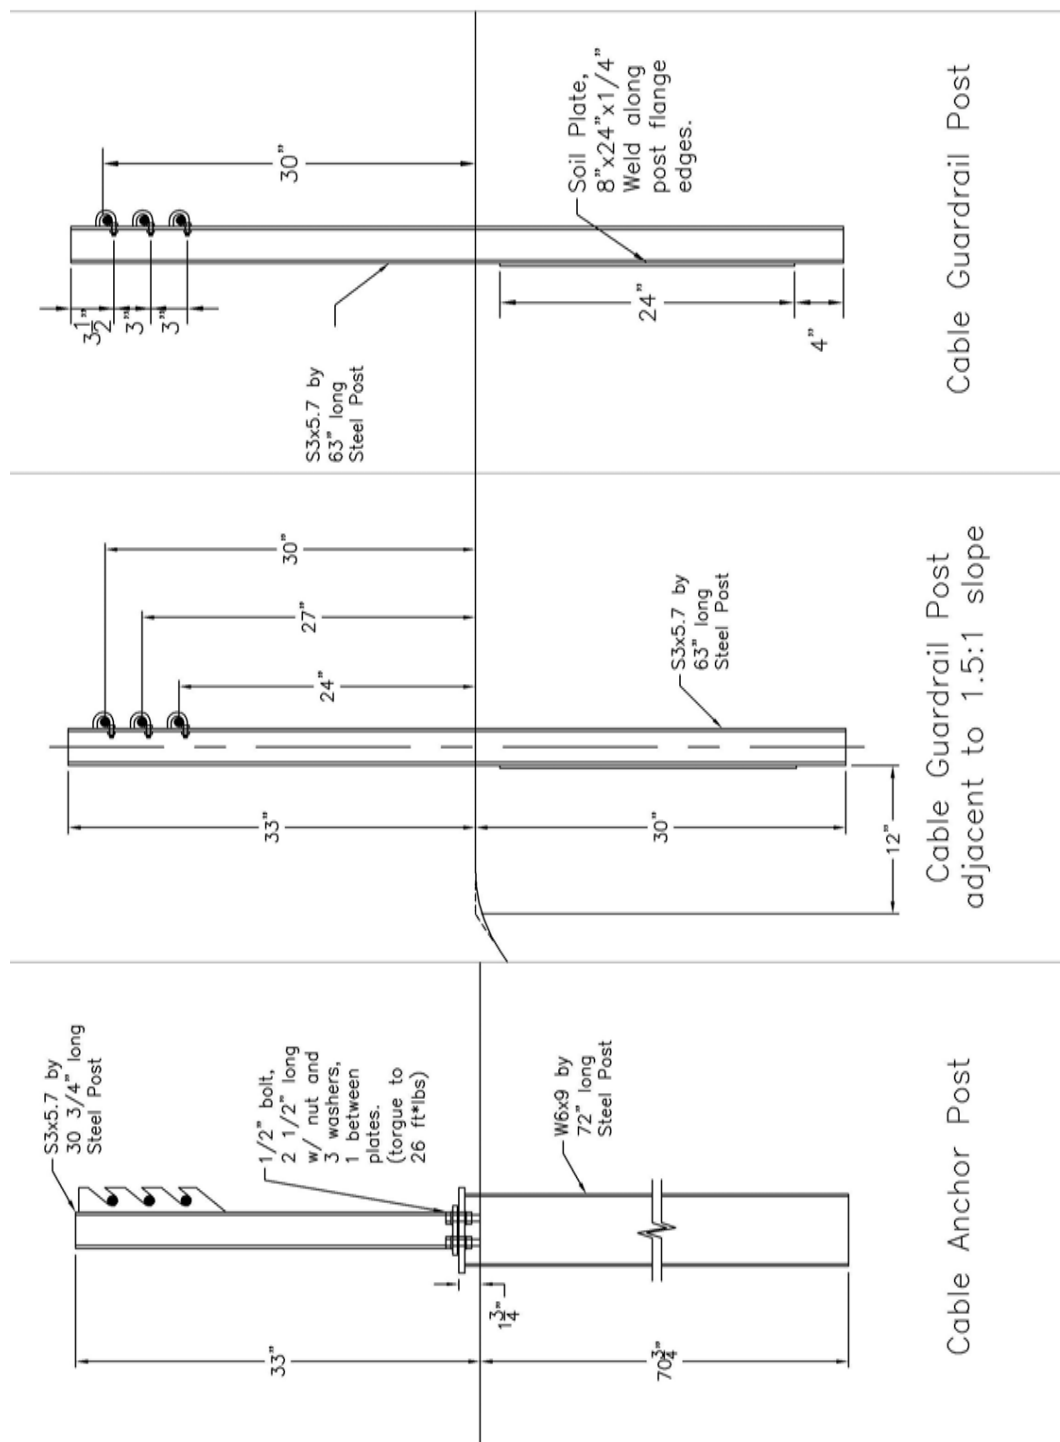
Typical Three-Cable Guardrail Post Overview (English)
